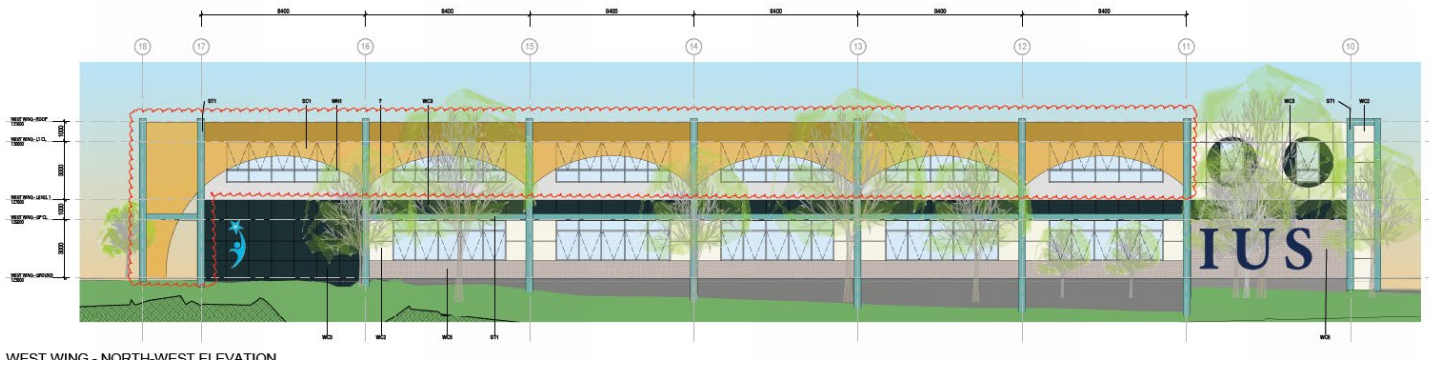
Extract of the north-west elevation of Wing West (when viewed from Nathalia Avenue)
